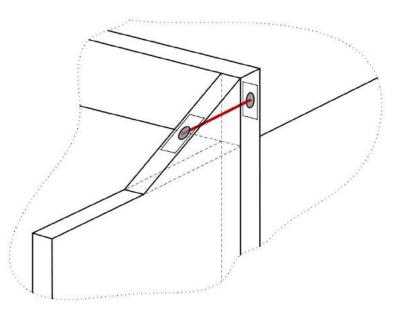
Retrofitting of the outlet walls using dowels. The new dowel is indicated in red. This figure is not to scale.
